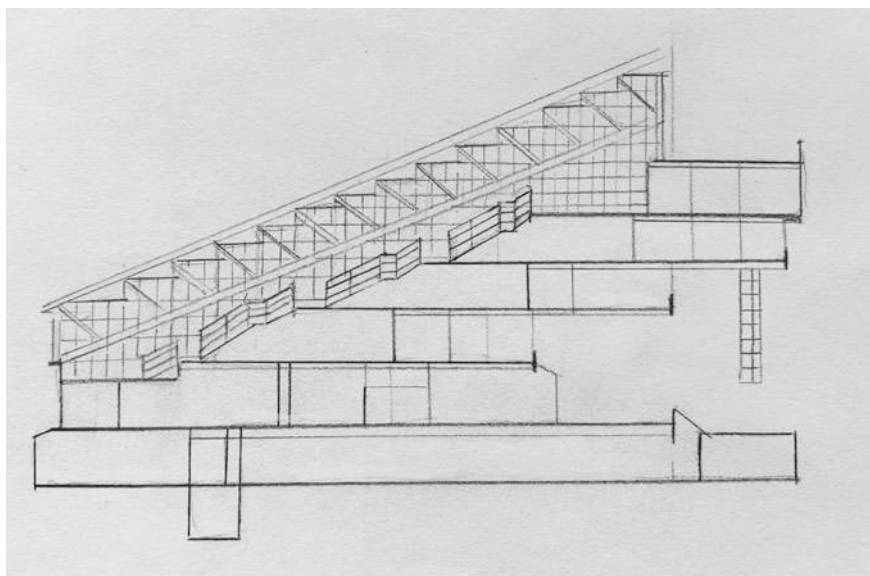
Gund Hall section drawing showing the open air, tiered studio space
